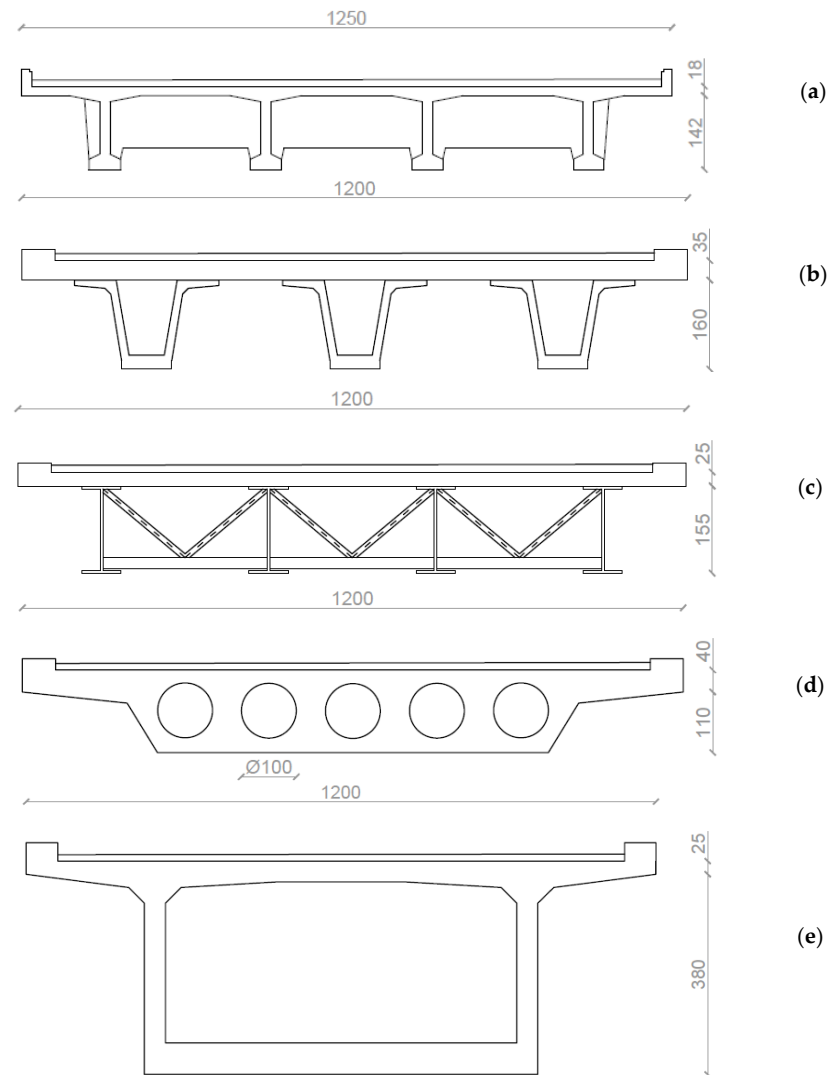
Deck cross-sections examined in the parametric study: (a) RC slab with T beams; (b) RC slab with V beams; (c) mixed deck; (d) RC slab with lightening tubes; (e) RC box girder. Measures in cm.
